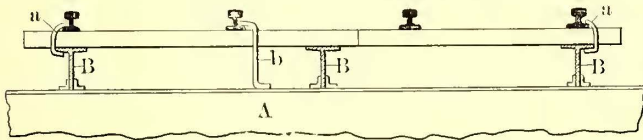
TOP MEMBER OF TRANSVERSE TRUSS ON BROOKLYN ELEVATED LINE
